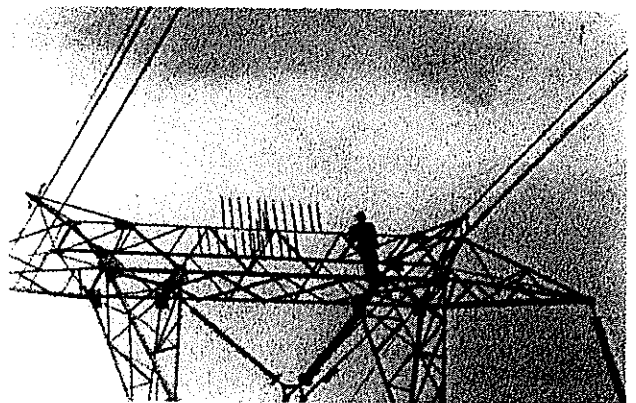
Illustration of Welded Rod Bird Guard
